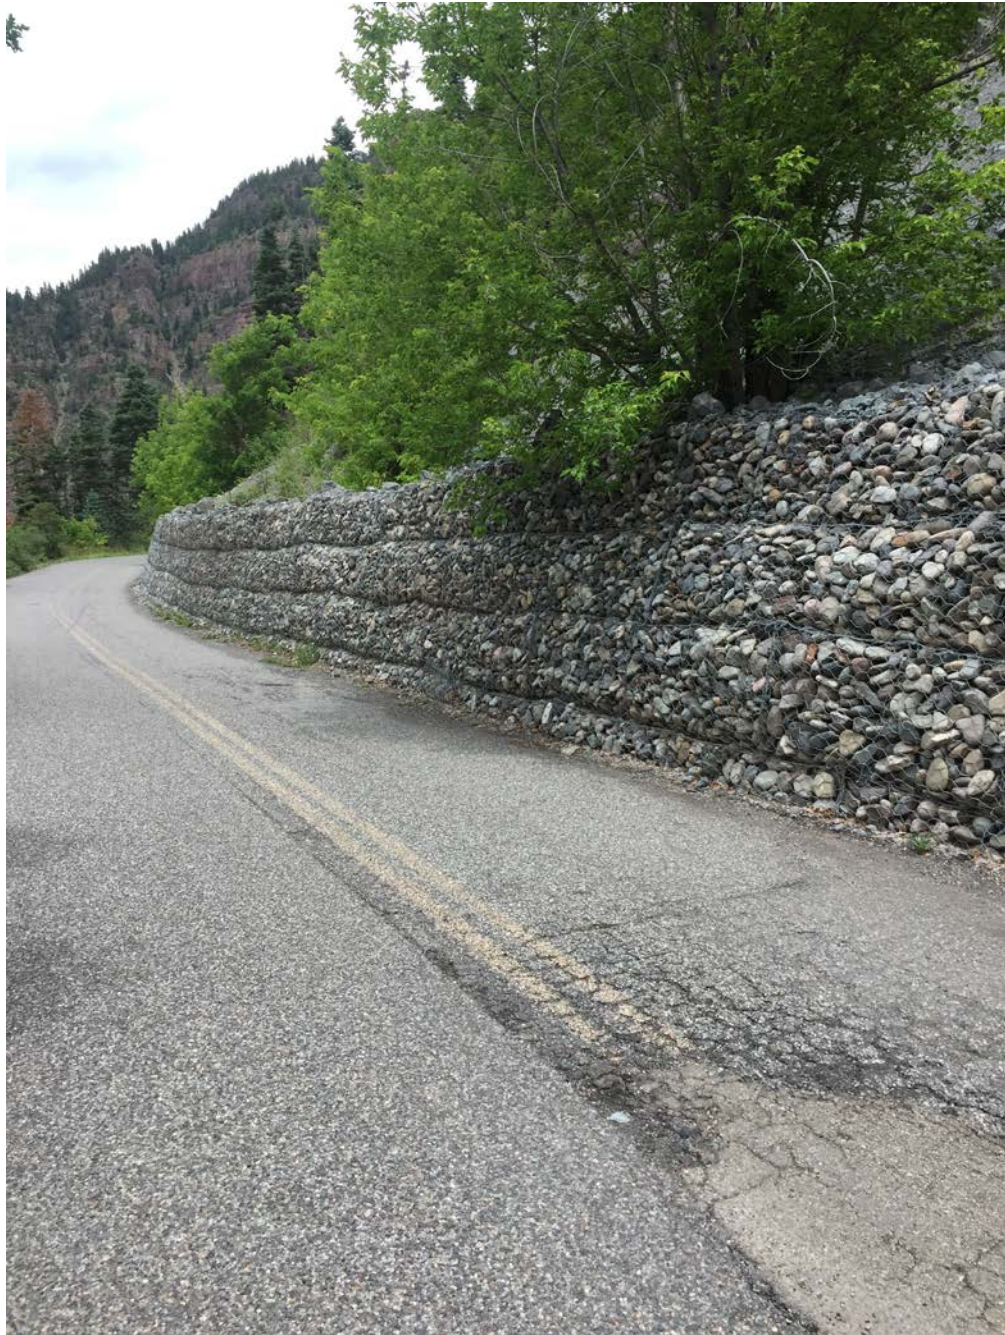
Gabions protecting existing road. (Photo by author: 2016)
